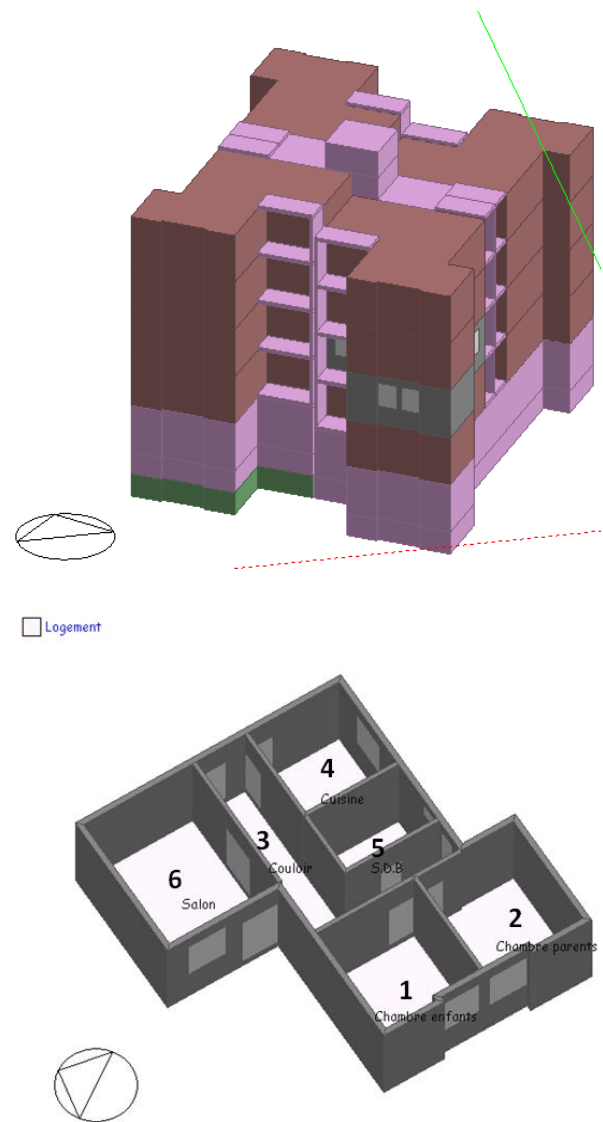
3D simulation model of the studied apartment and building (source: Author, 2015).
